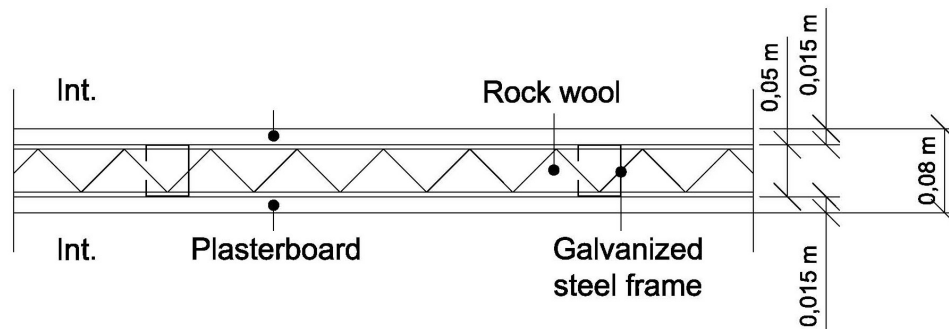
Horizontal cross section of wall W2: plasterboard.
